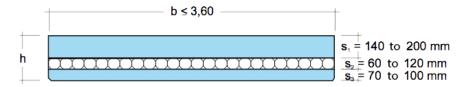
Precast sandwich façade panel with load-bearing, insulation and cladding layer, Source: FDB e.V. / Verlag Bau+Technik GmbH Düsseldorf
